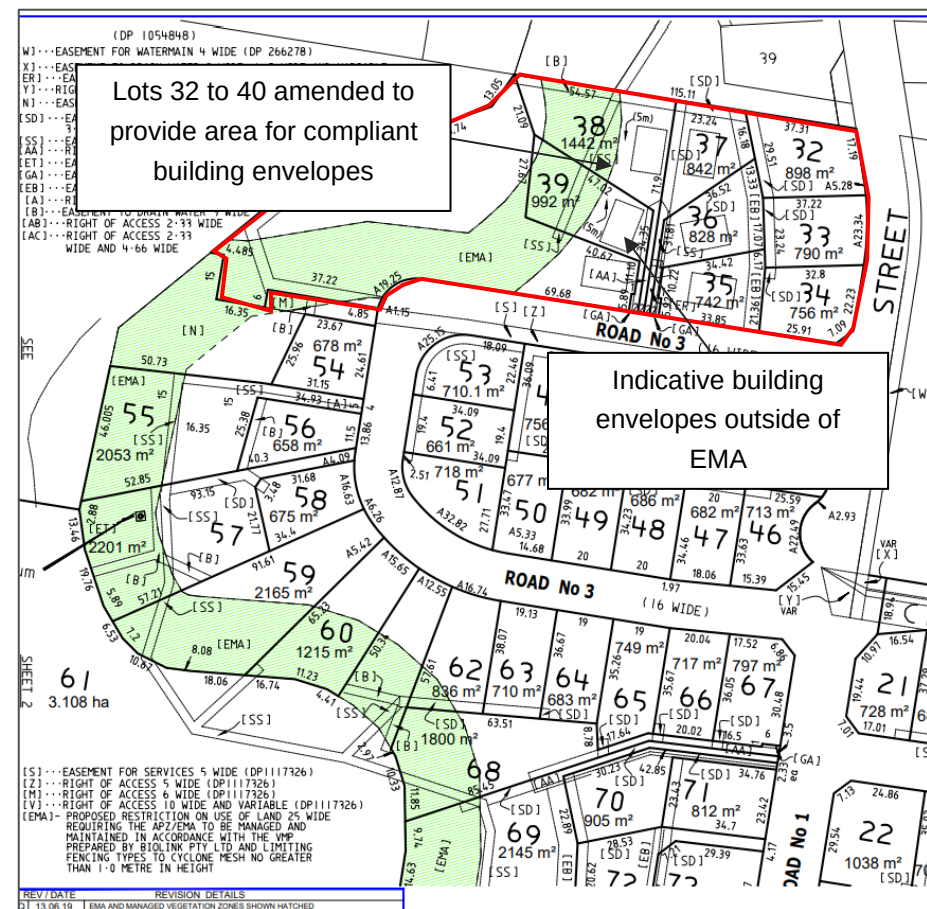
| Proposed subdivision layout - Lots 32 to 40 (outlined in red) modified
